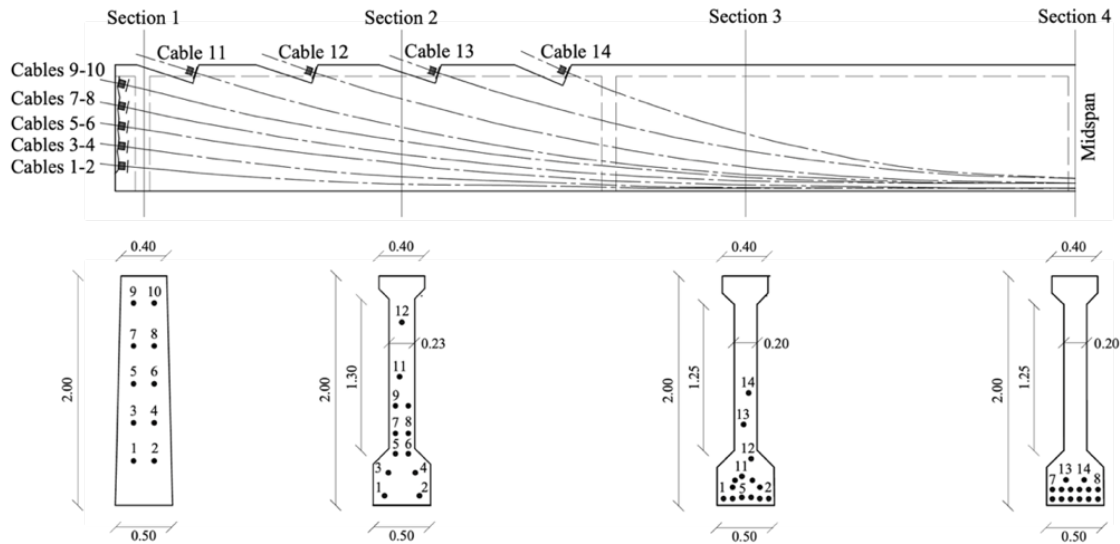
Longitudinal and transversal section of girders with post-tensioned cables
